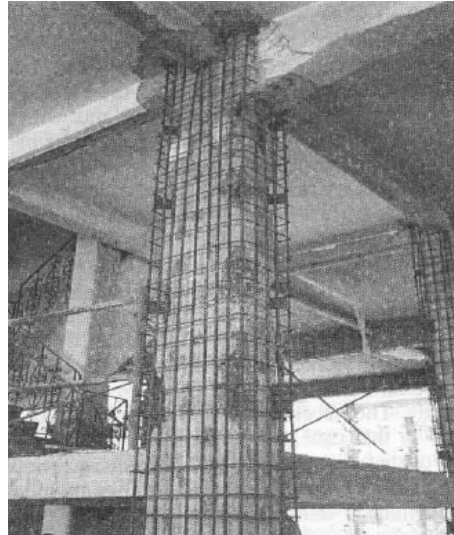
Concrete jacketing of a column (fib, 2003a)
